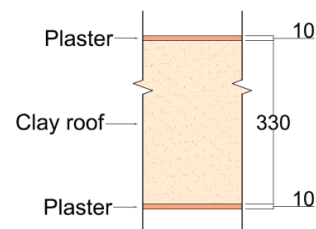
M6 roof cross-sectional detail. All dimensions are in millimetres.
